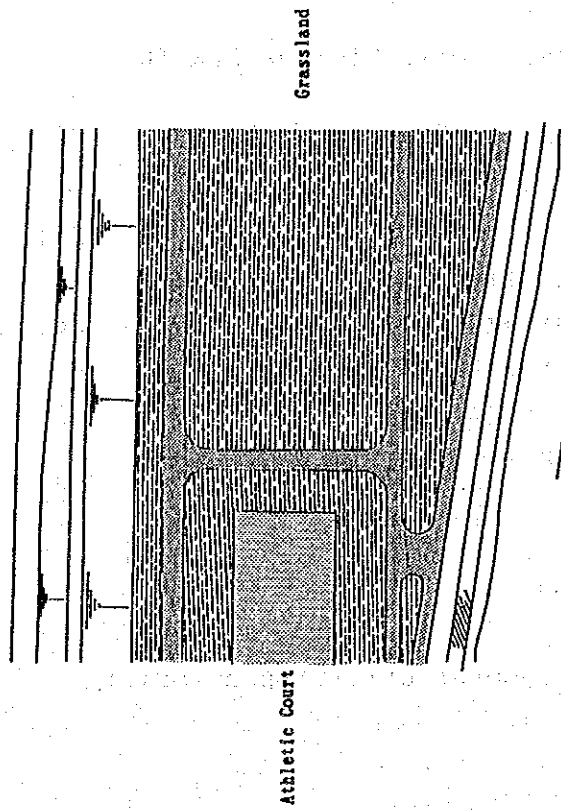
Space Improvement Plan of Anyang Chong on Every Zone
